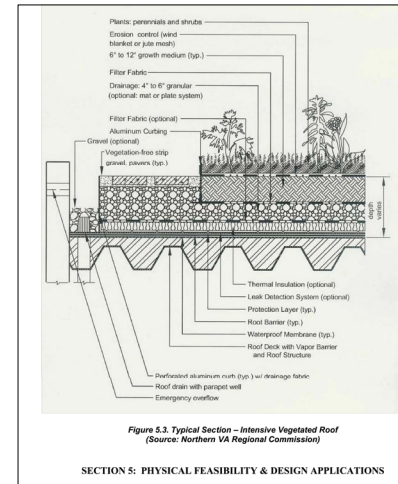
Typical Section - Intensive Vegetated Roof (Source: Northern VA Regional Commission)
